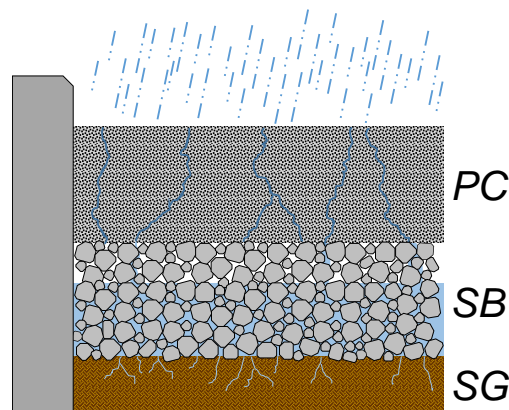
Simple cross-section of pervious concrete system showing percolation of stormwater through the pervious concrete (PC) down to the subbase (SB). Water further percolates through the subgrade (SG), if permeable.
